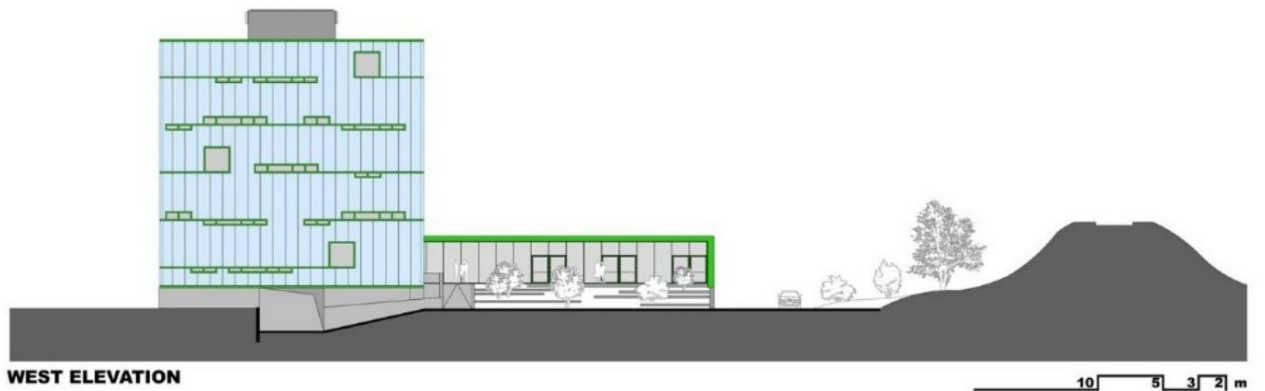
INCUBOXX WEST ELEVATION (Gaivoronschi, 2014)
